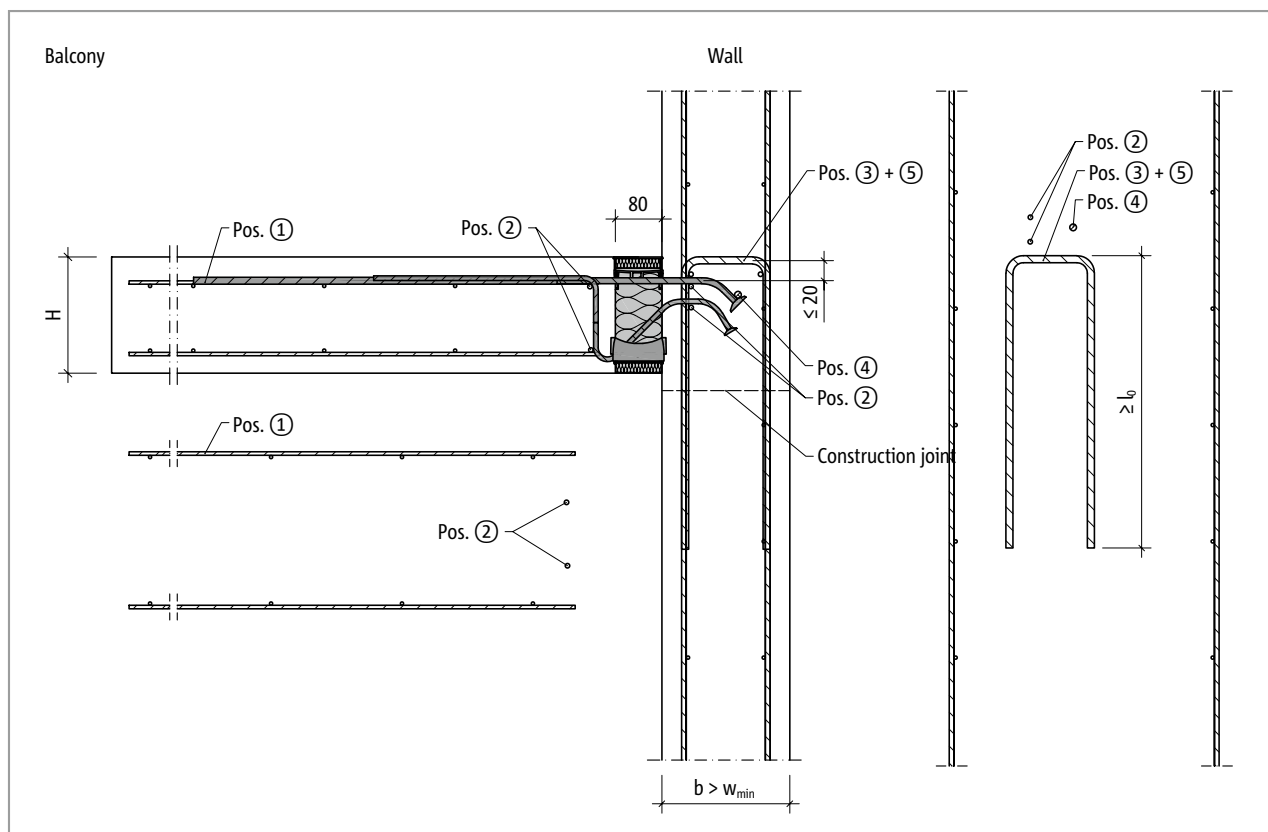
Schöck Isokorb® T type K-O: On-site reinforcement for wall connection with larger structural element dimension ($w_{exist} > w_{min}$)
